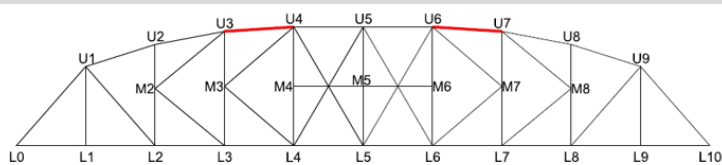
Overstressed Truss Members (Span 3) – Rehabilitation with Widening
